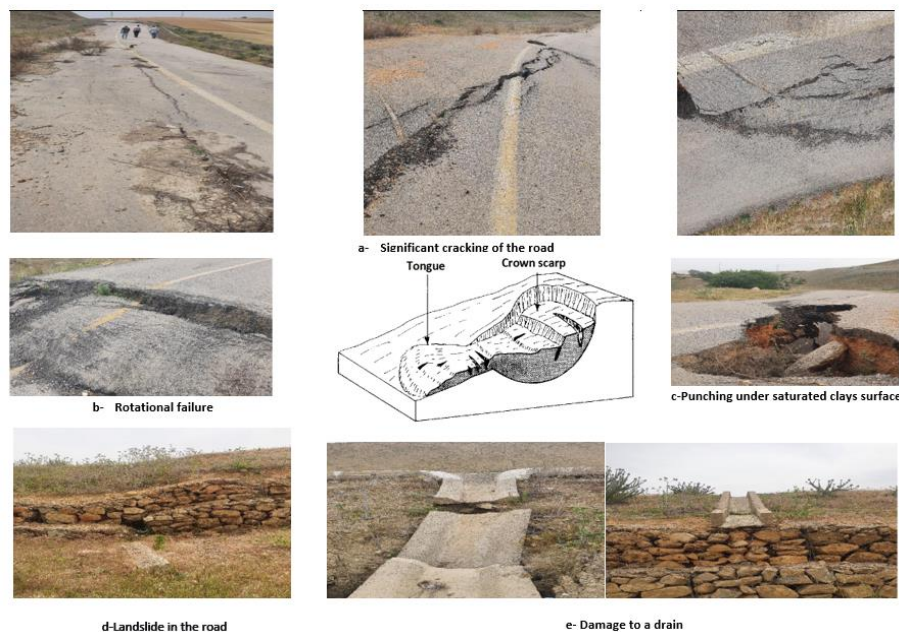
Road subsidence and cracking on the My Yaacoub section (P5007 road).
